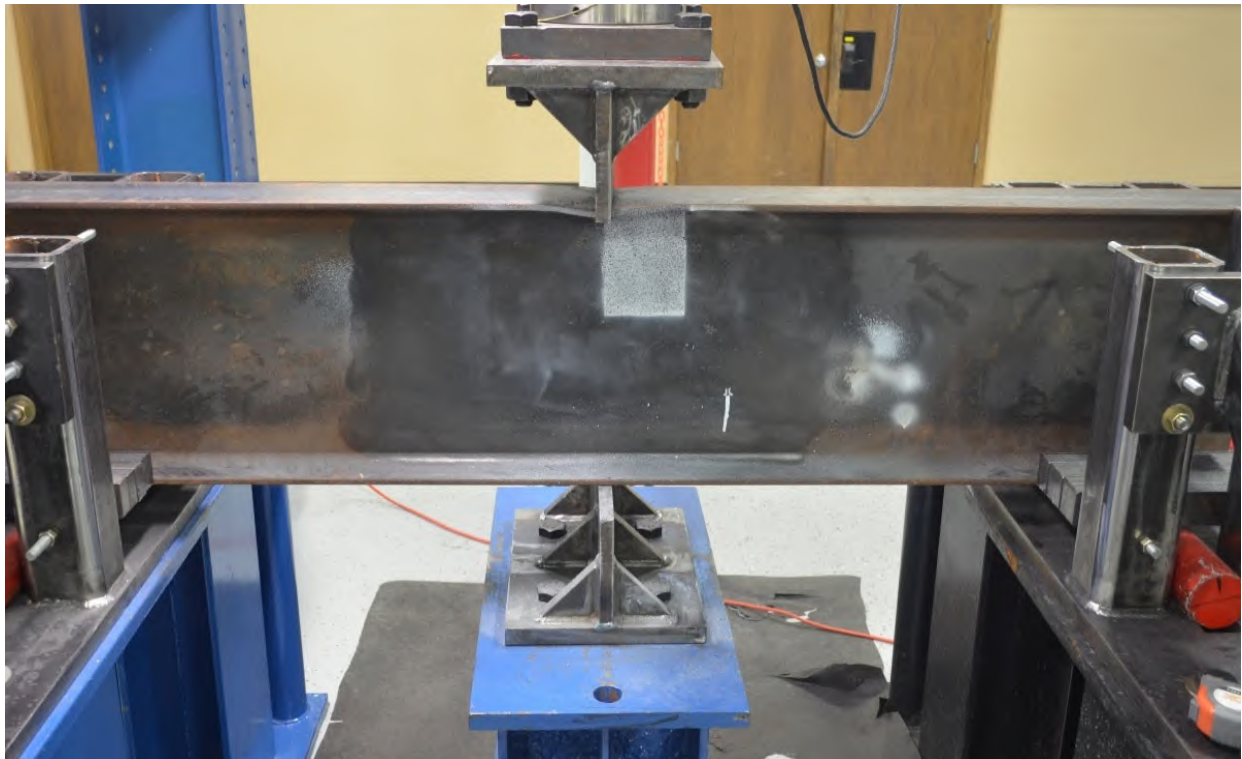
Side view of W12X26-SC-E0 after testing emphasizing yielding
